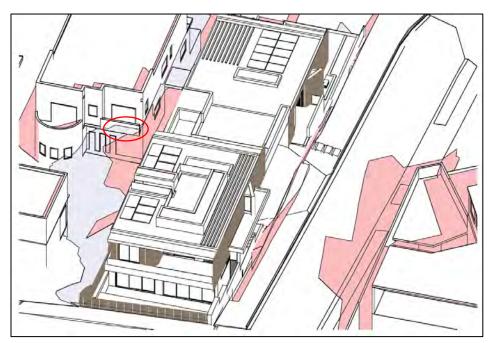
Additional overshadowing impacts demonstrated in purple with location of external wall height breach circled.
